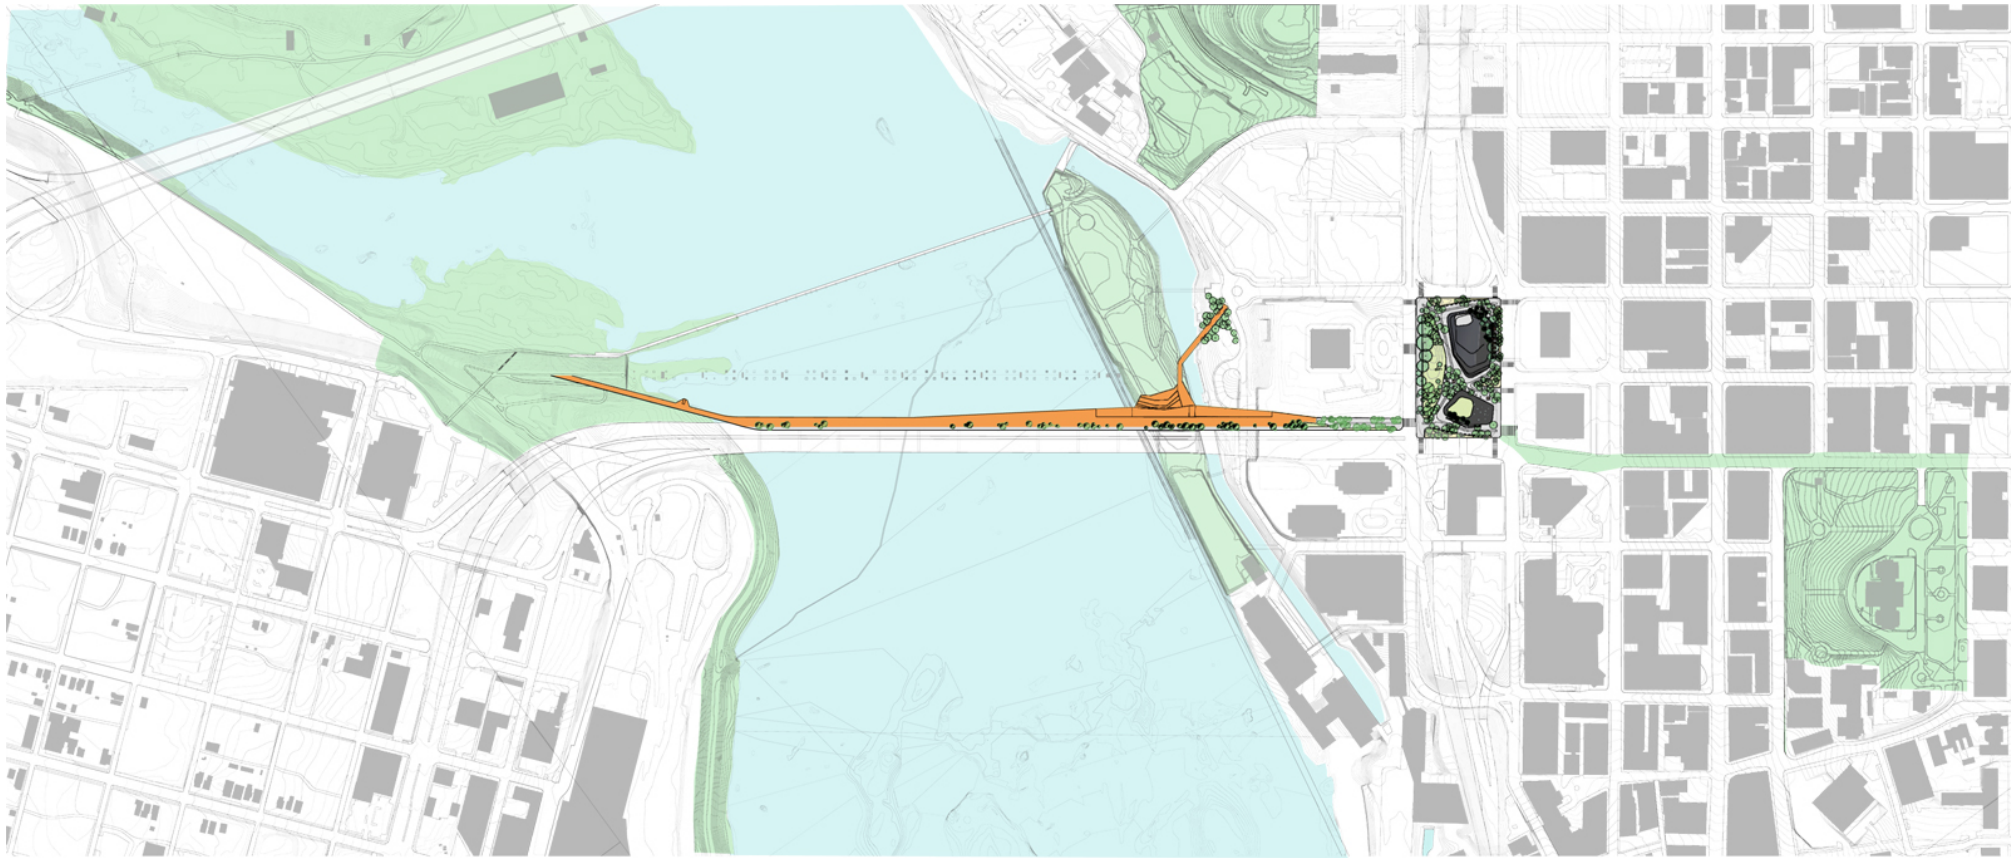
Manchester Bridge, site for BridgePark over view (source: BridgePark Foundation)
